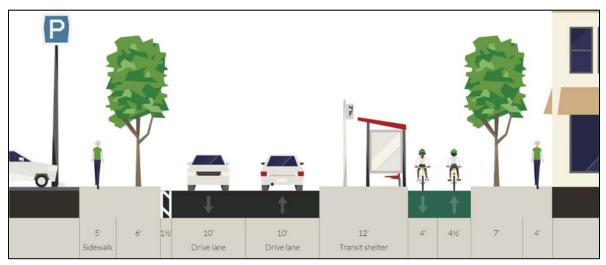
William Street Cross Section between Ashley Street and Main Street – Proposed with Floating Bus Stop
